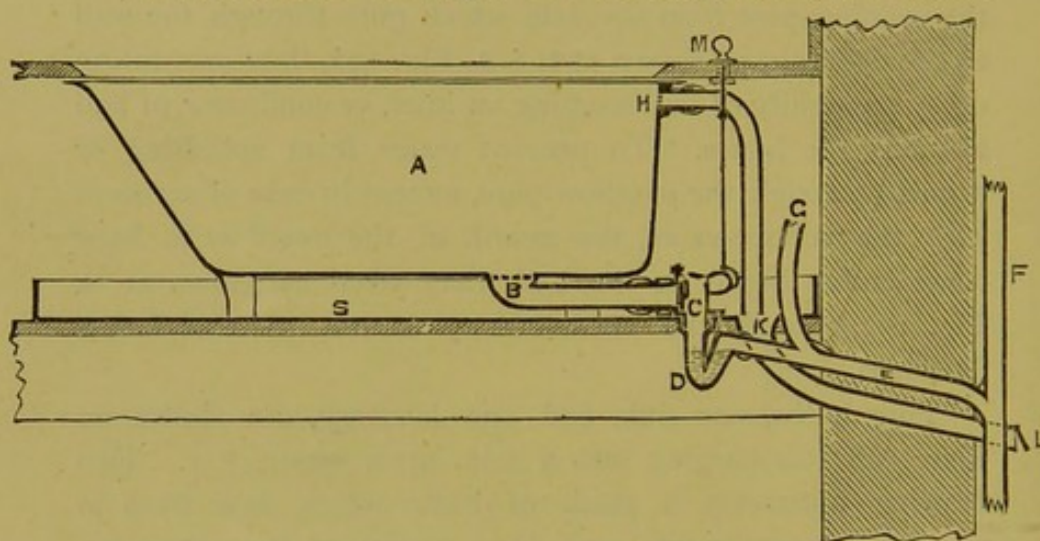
Section of Bath, Trap, and Branch Waste, &c.
